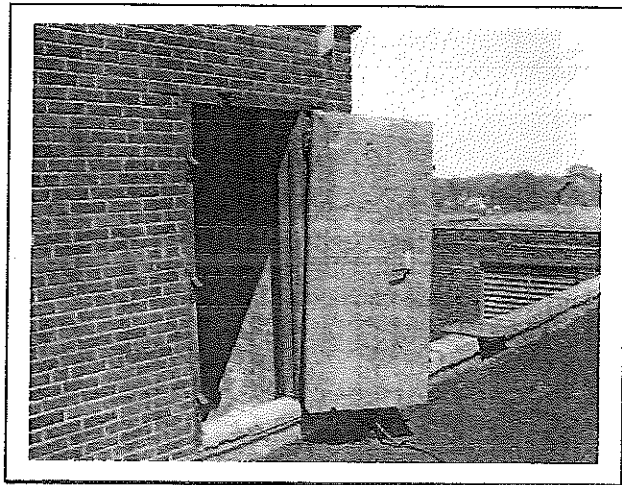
Viewing green roof entry door, Exterior – East side.
